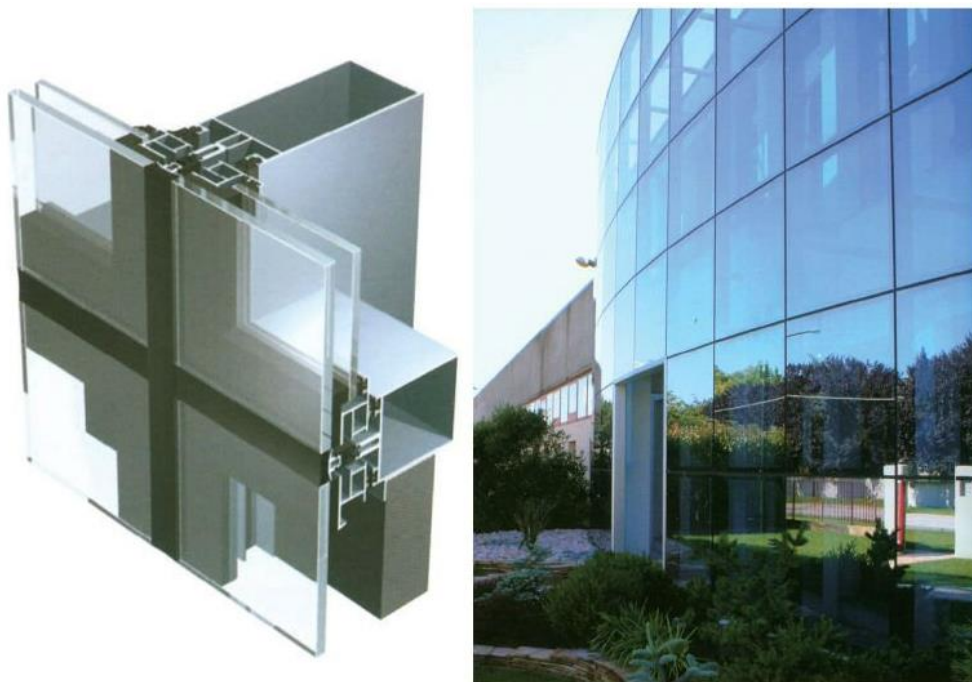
A typical structure and image of a glass curtain wall (Alibaba, 2016).
